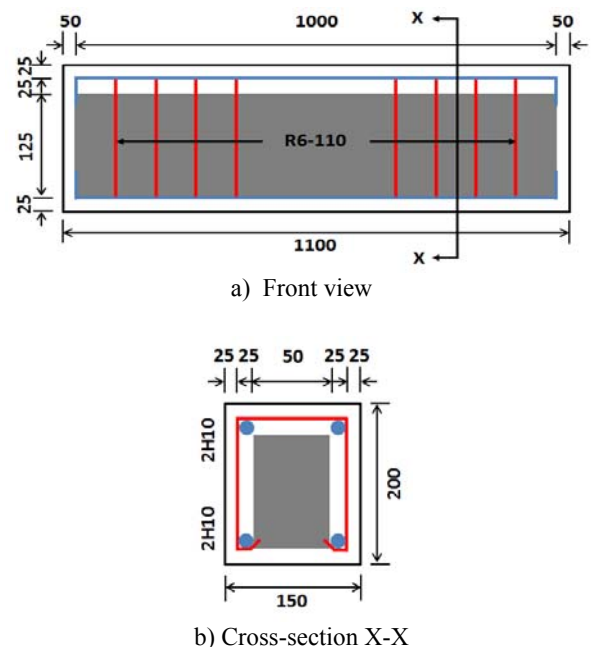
Schematic design of reinforced concrete beam with foamed concrete infill.
